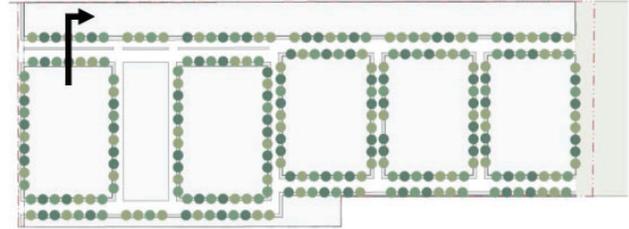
Northern East-West Street - 108-foot Right of Way
